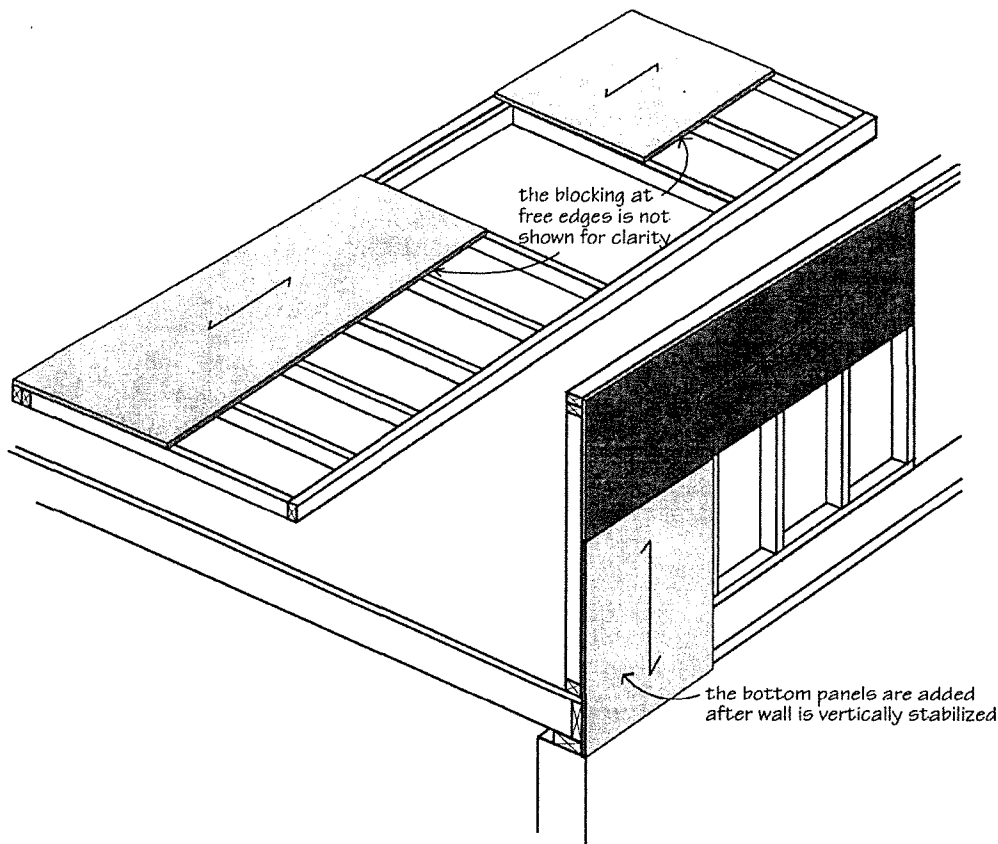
Unique Approach to Sheathing Stud Wall
